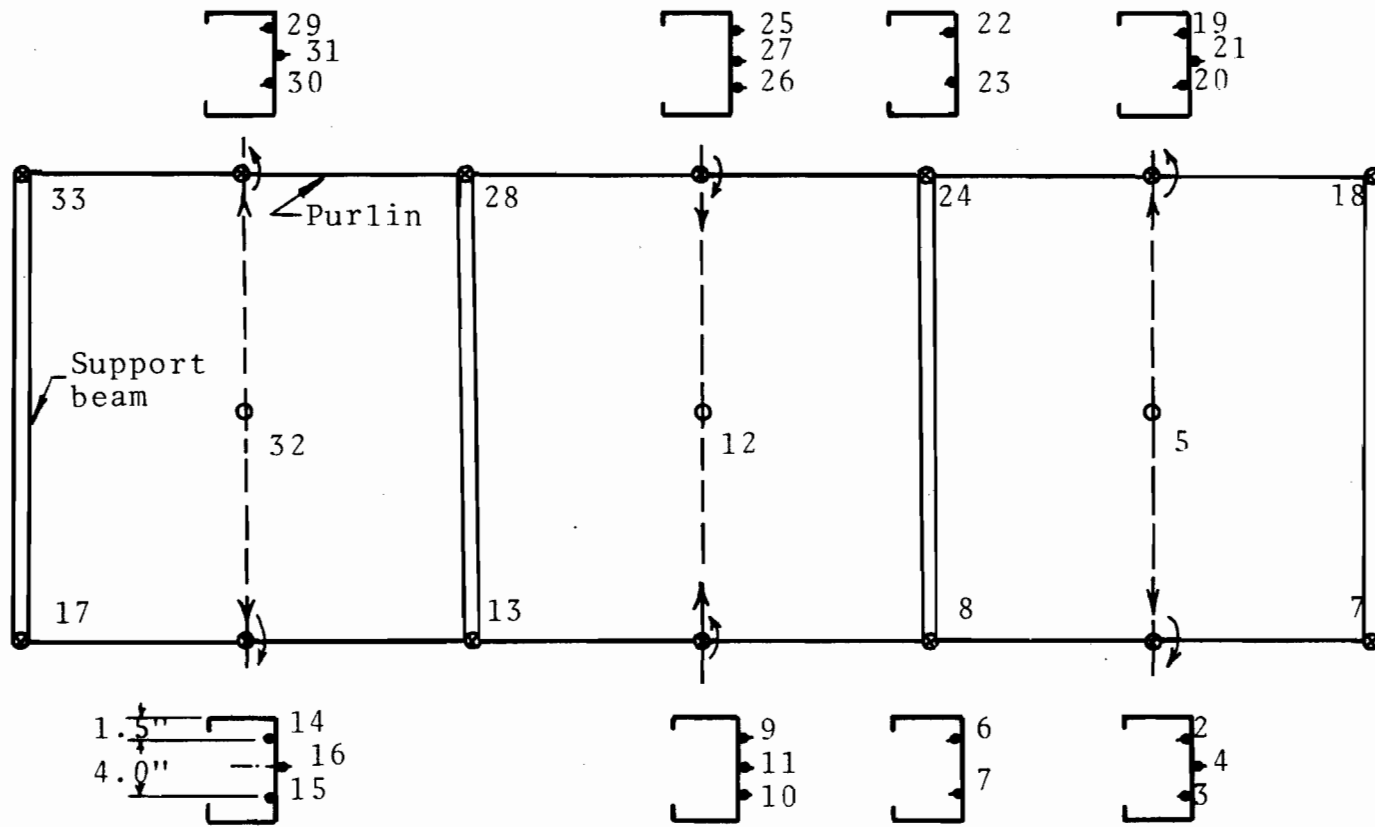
Dial Gage Locations - C-Section Purlin Test
